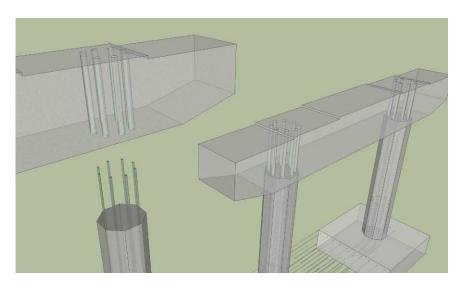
Grouted Post-tensioning Duct Connection Top Sketch: Installation Bottom Sketch: Transparent View
